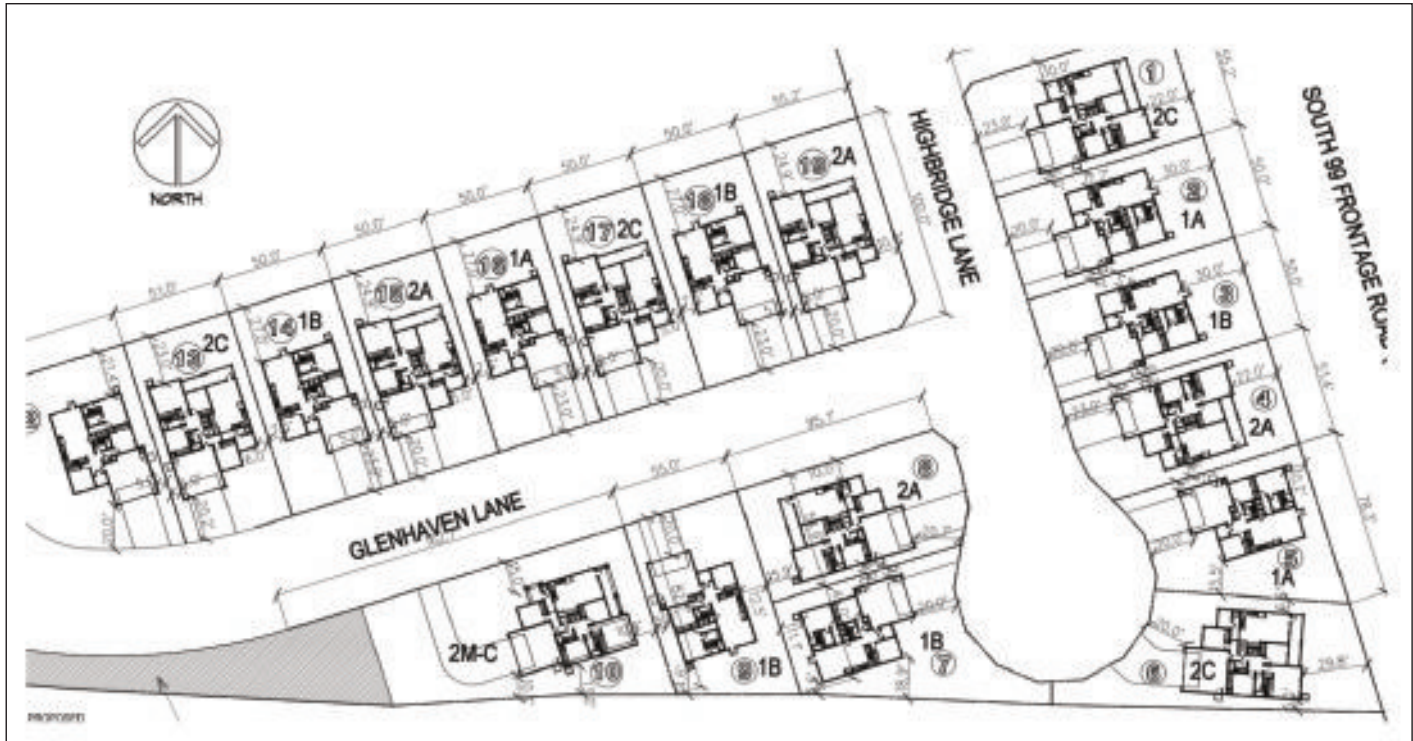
Site plan for the Dream Creek Development, Stockton, CA
